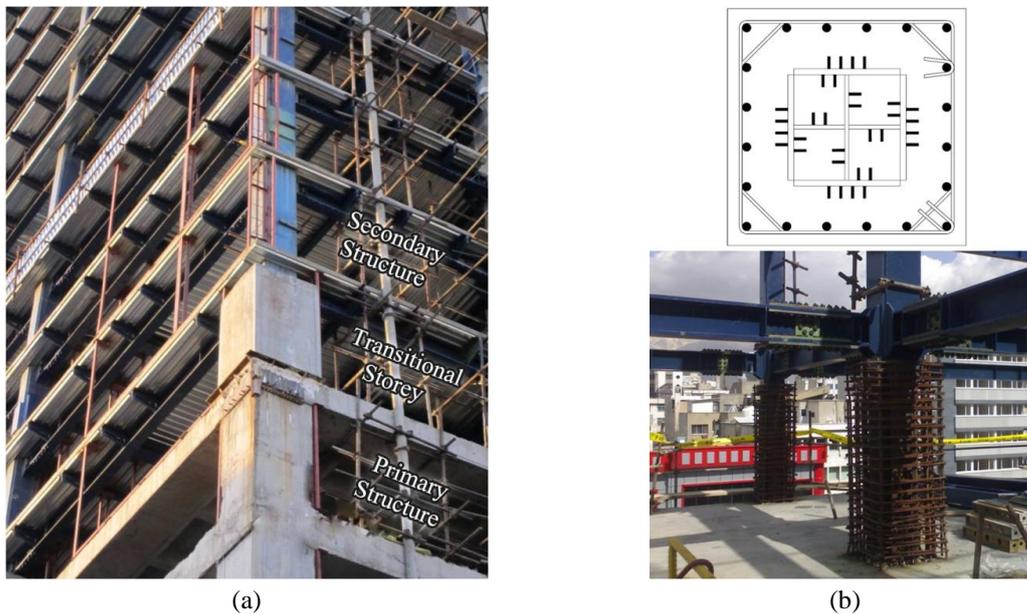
(a) Concrete-steel hybrid building (b) Details of transitional storey
